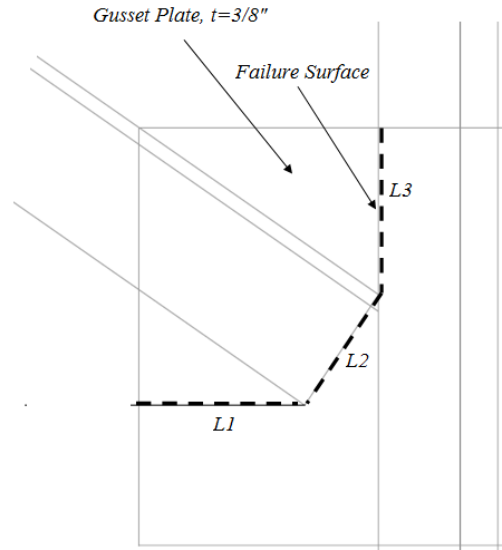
Failure Mechanism for Gusset Plate
